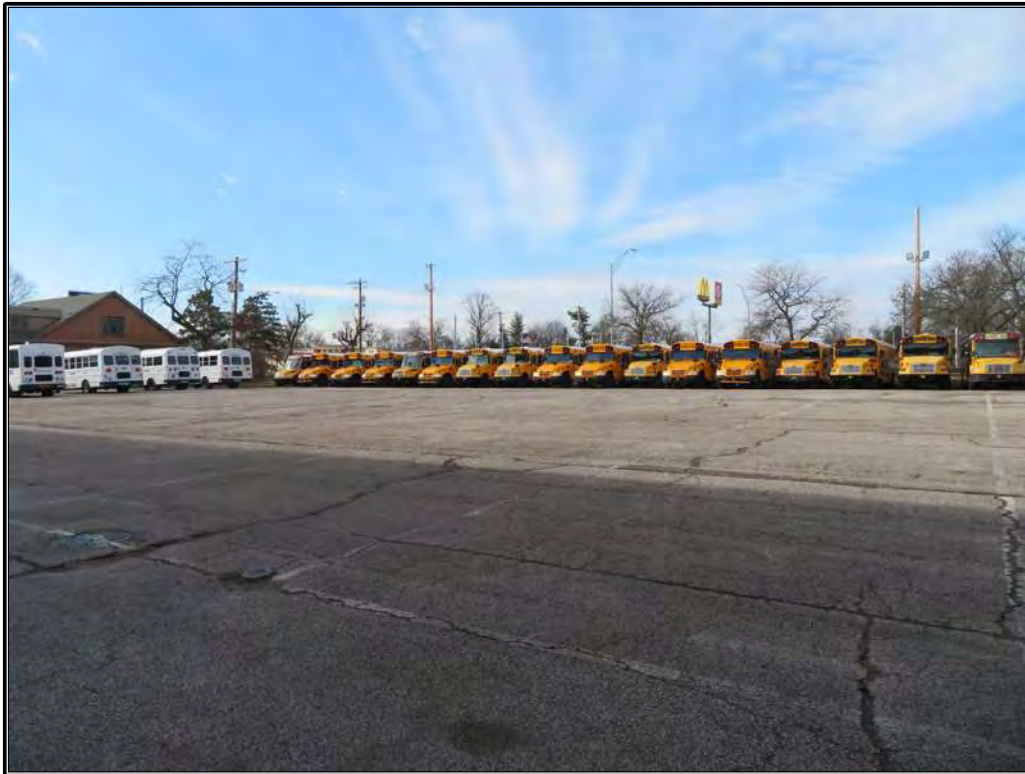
Overview of project area from the Enlow Field parking lot, facing southwest.
